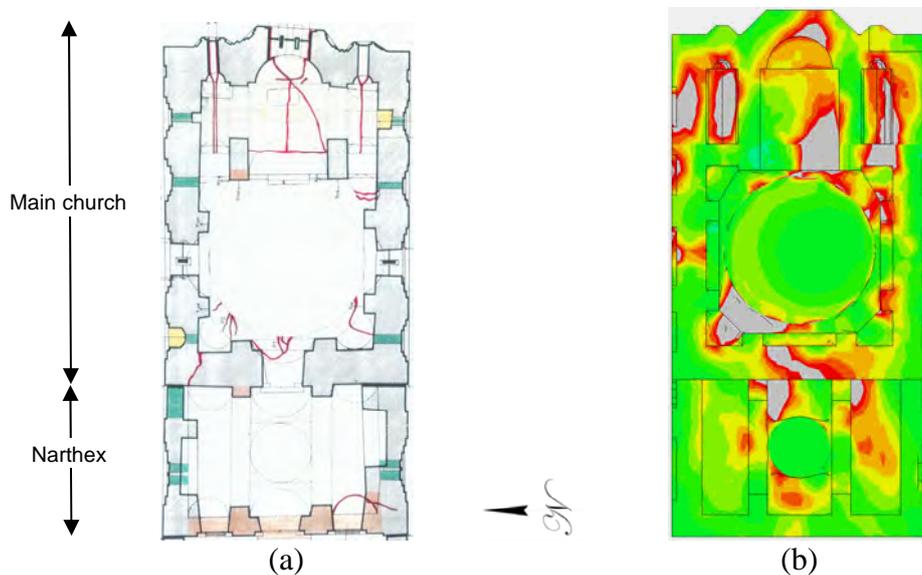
View of the roof (from below): (a) existing crack pattern; (b) principal tensile stresses at time step 278.
